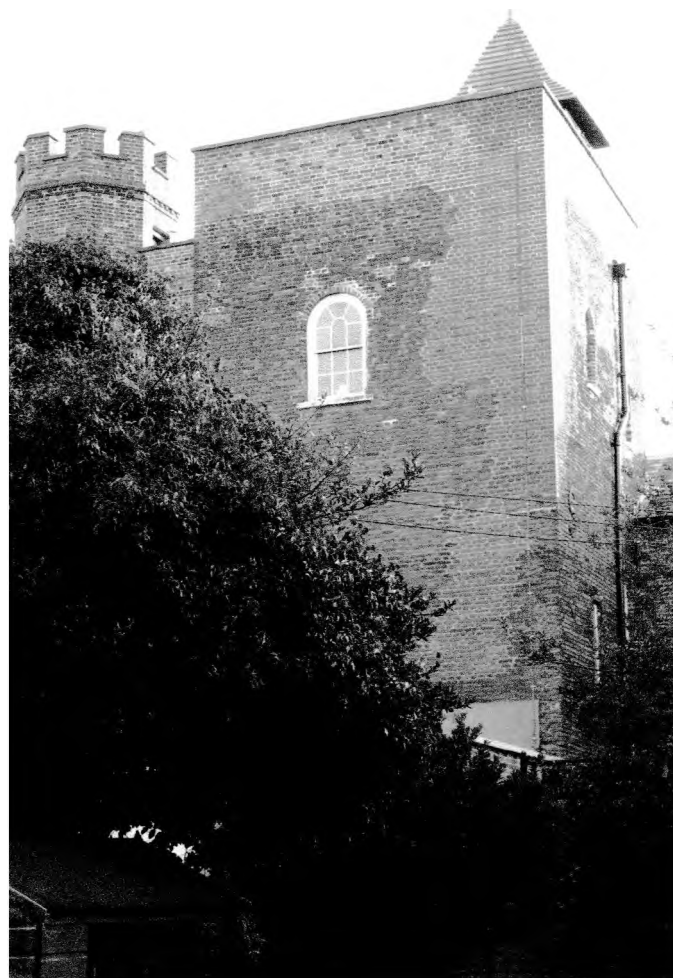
The north front showing the 1986 repair to the north west corner. Also note the rebuilt parapet and upper section of the stair turret.
